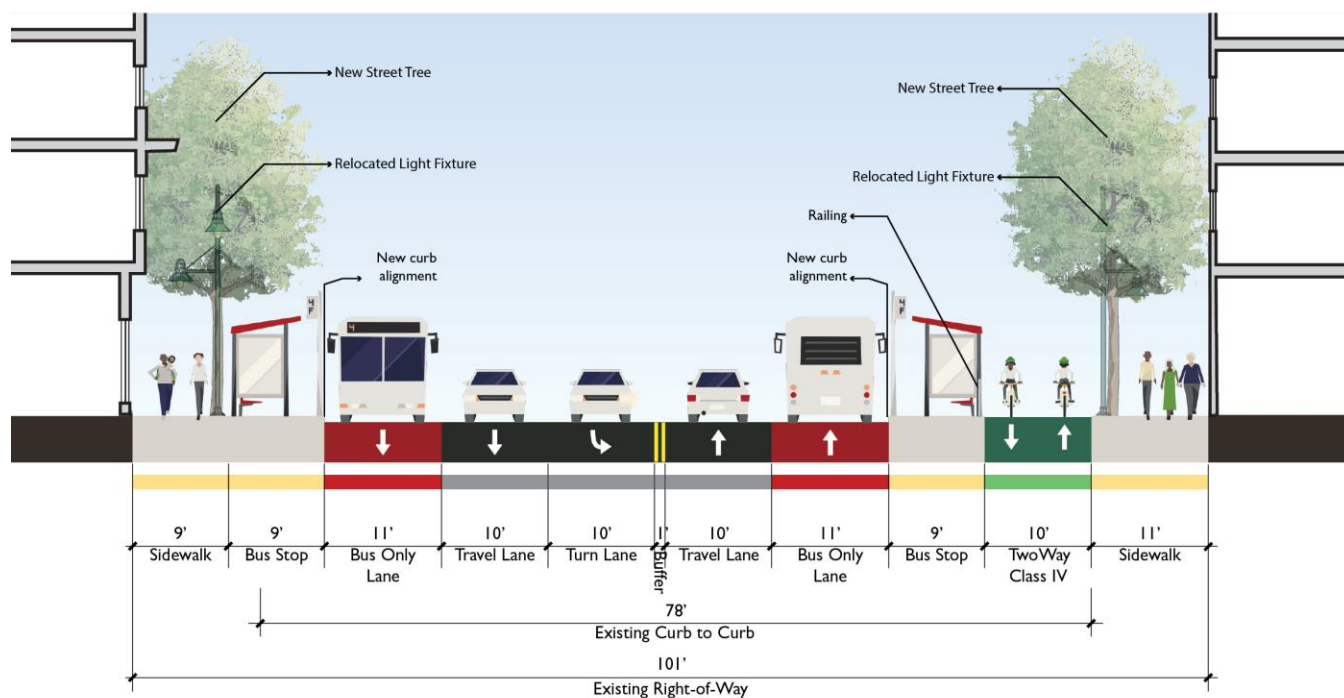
40th Street bus stops at Adeline Street (looking west) – SECTION A
